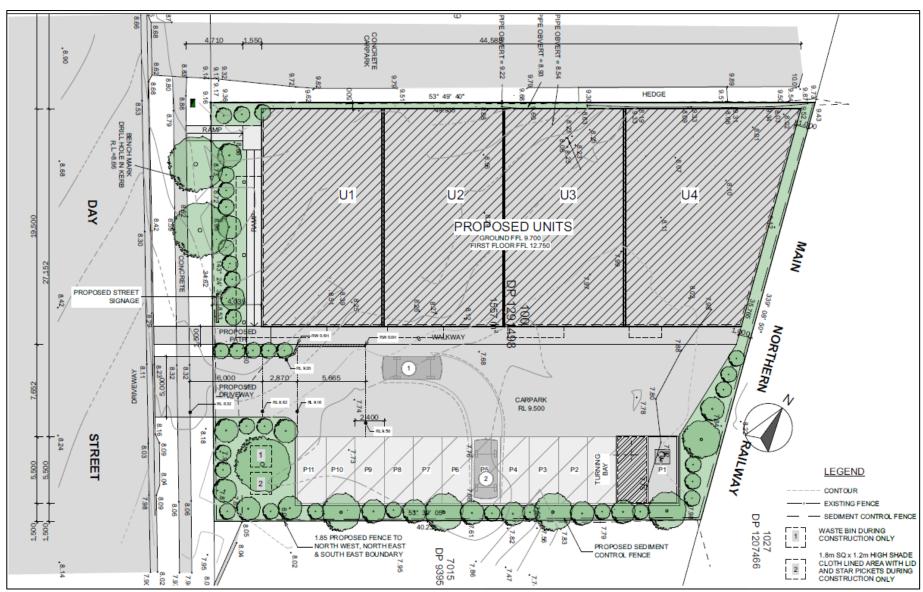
Proposed Site plan (Source: Sorensen Design, 2023)
